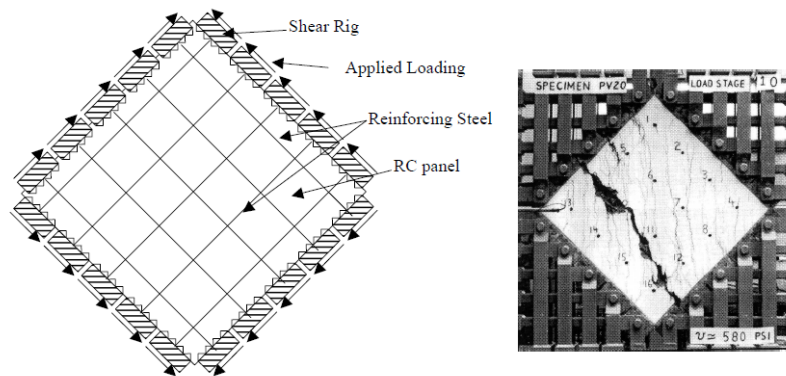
RC panel element tested by (Vecchio and Collins 1986)
